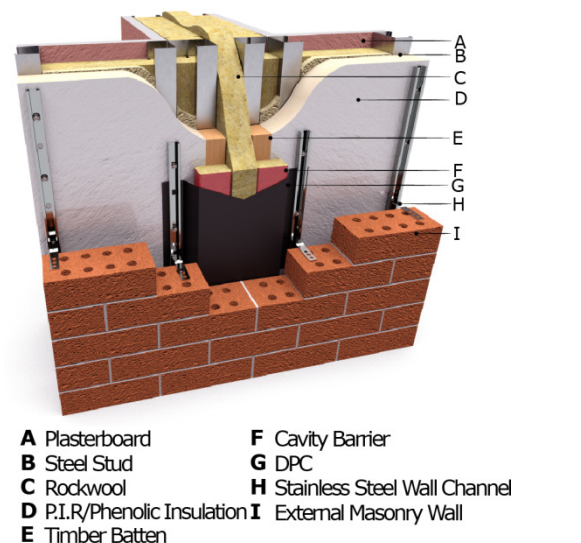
Party wall detail (option 2) at junction with external masonry wall
